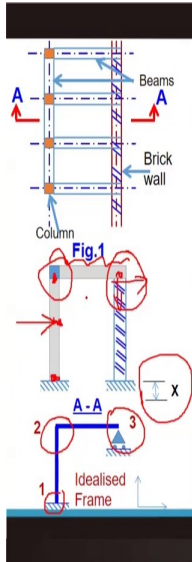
shows the plan of a building with masonry walls and concrete beam / column system. The cross section shows the brick wall, beams, and columns. The idealised frame also is shown with two members and three joints.
